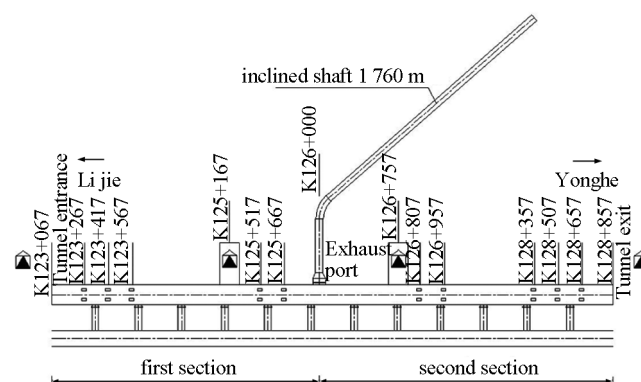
Plan view of ventilation scheme 1 for Zhagaliang Tunnel
